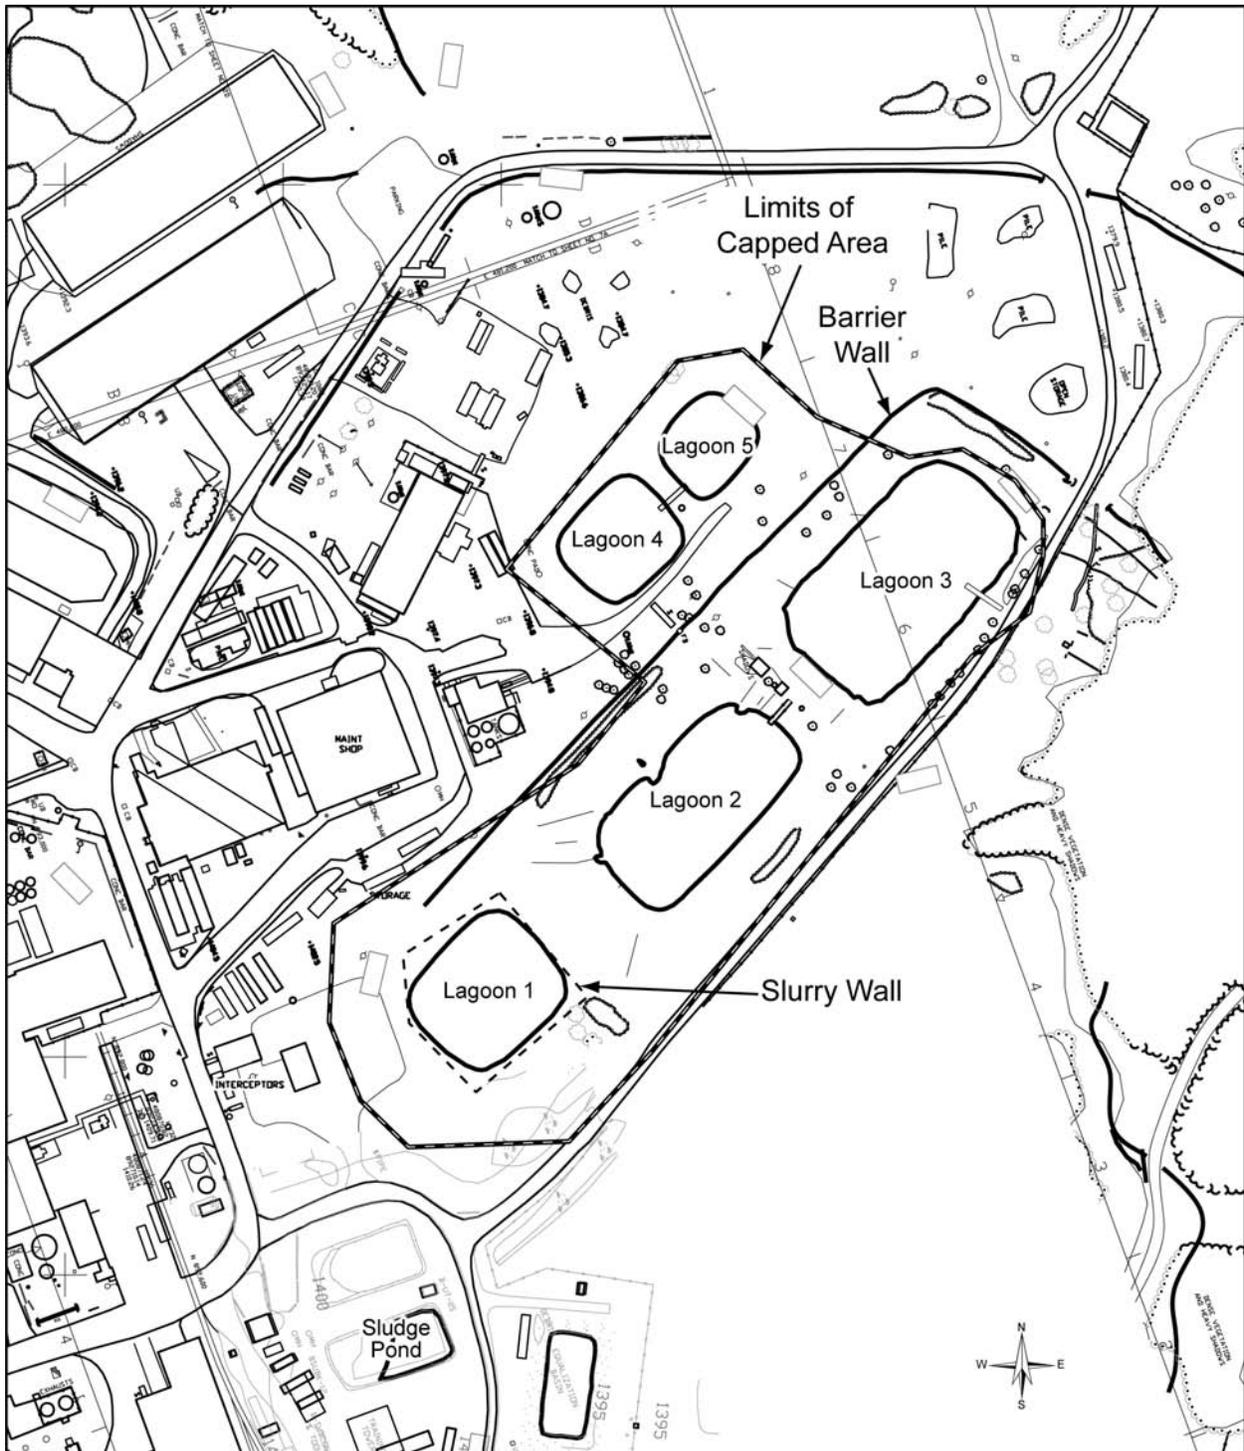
Plan View of Cap and Slurry Wall in Waste Management Area 2
